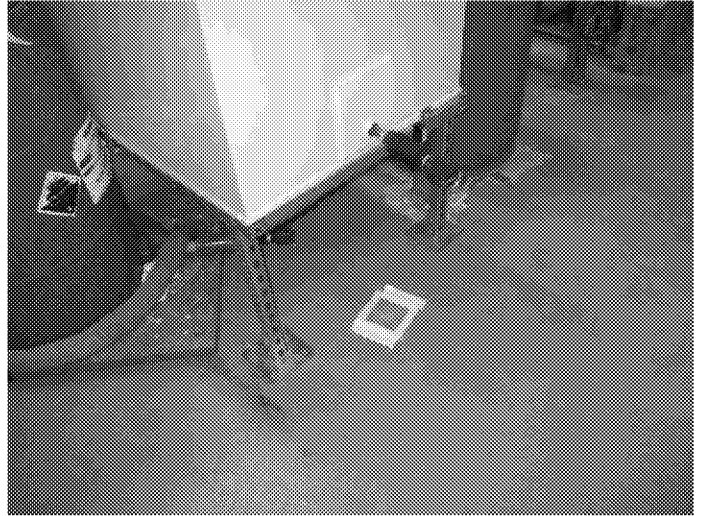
WWAN Room – Cd/Se Wipe Sample in same area as Bulk Sample Cd5.
